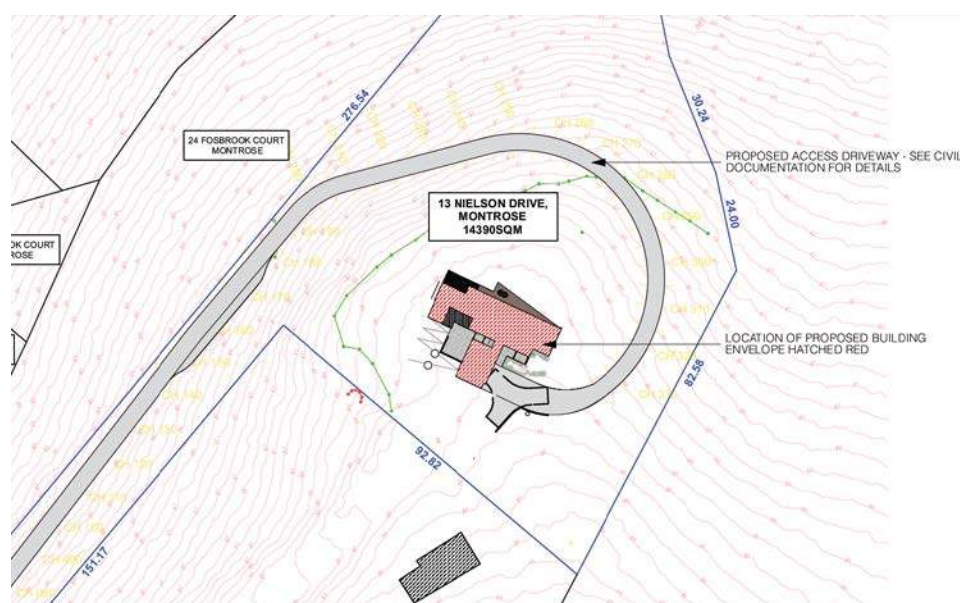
Proposed Layout, extract from IDW P/L drawing package
